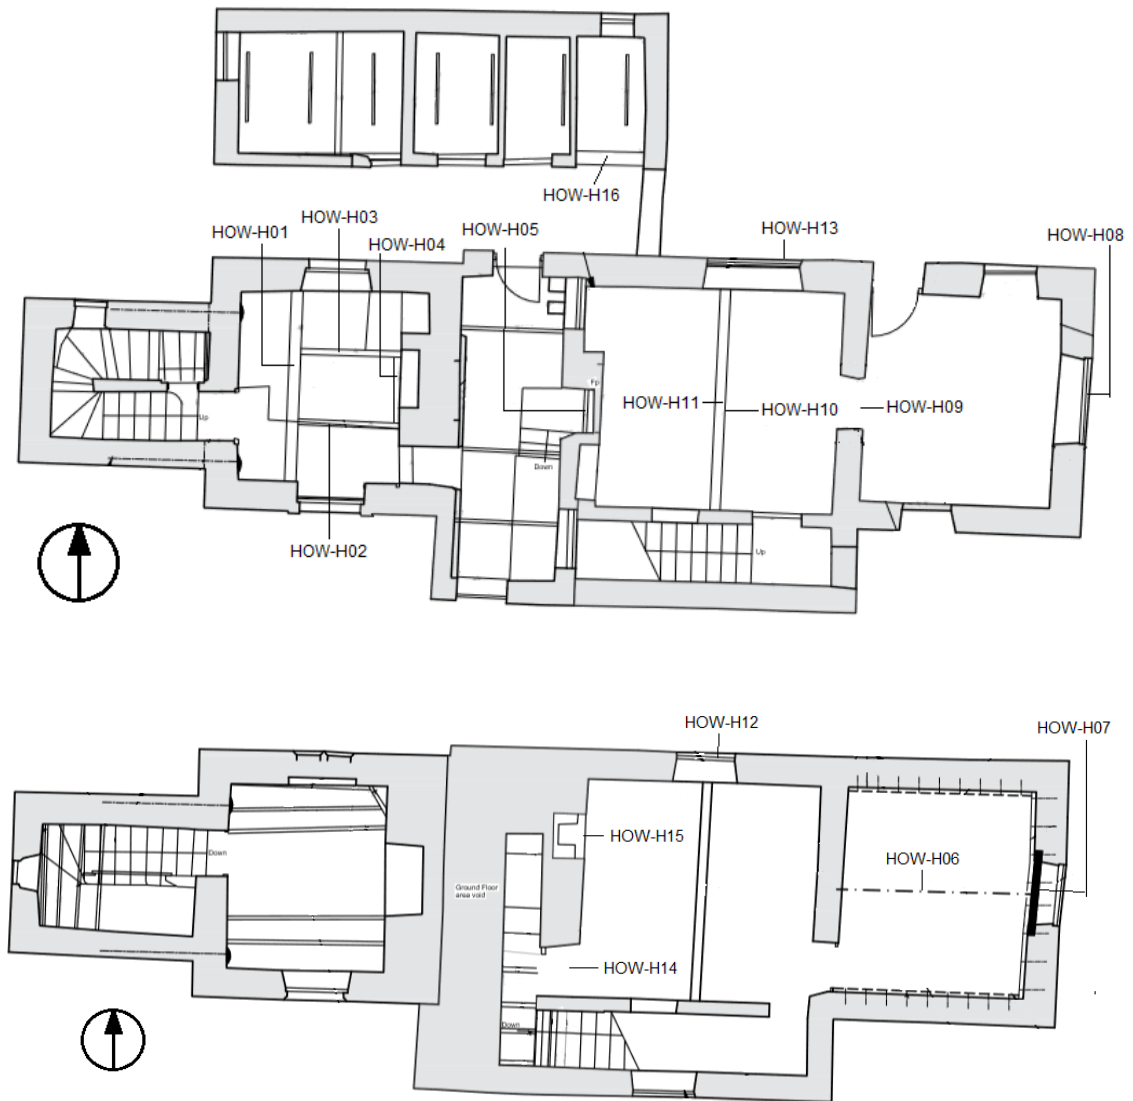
Ground-floor plan (top) and first-floor plan (bottom), showing the location of samples HOW-H01–16 (Mason Clark Associates)
